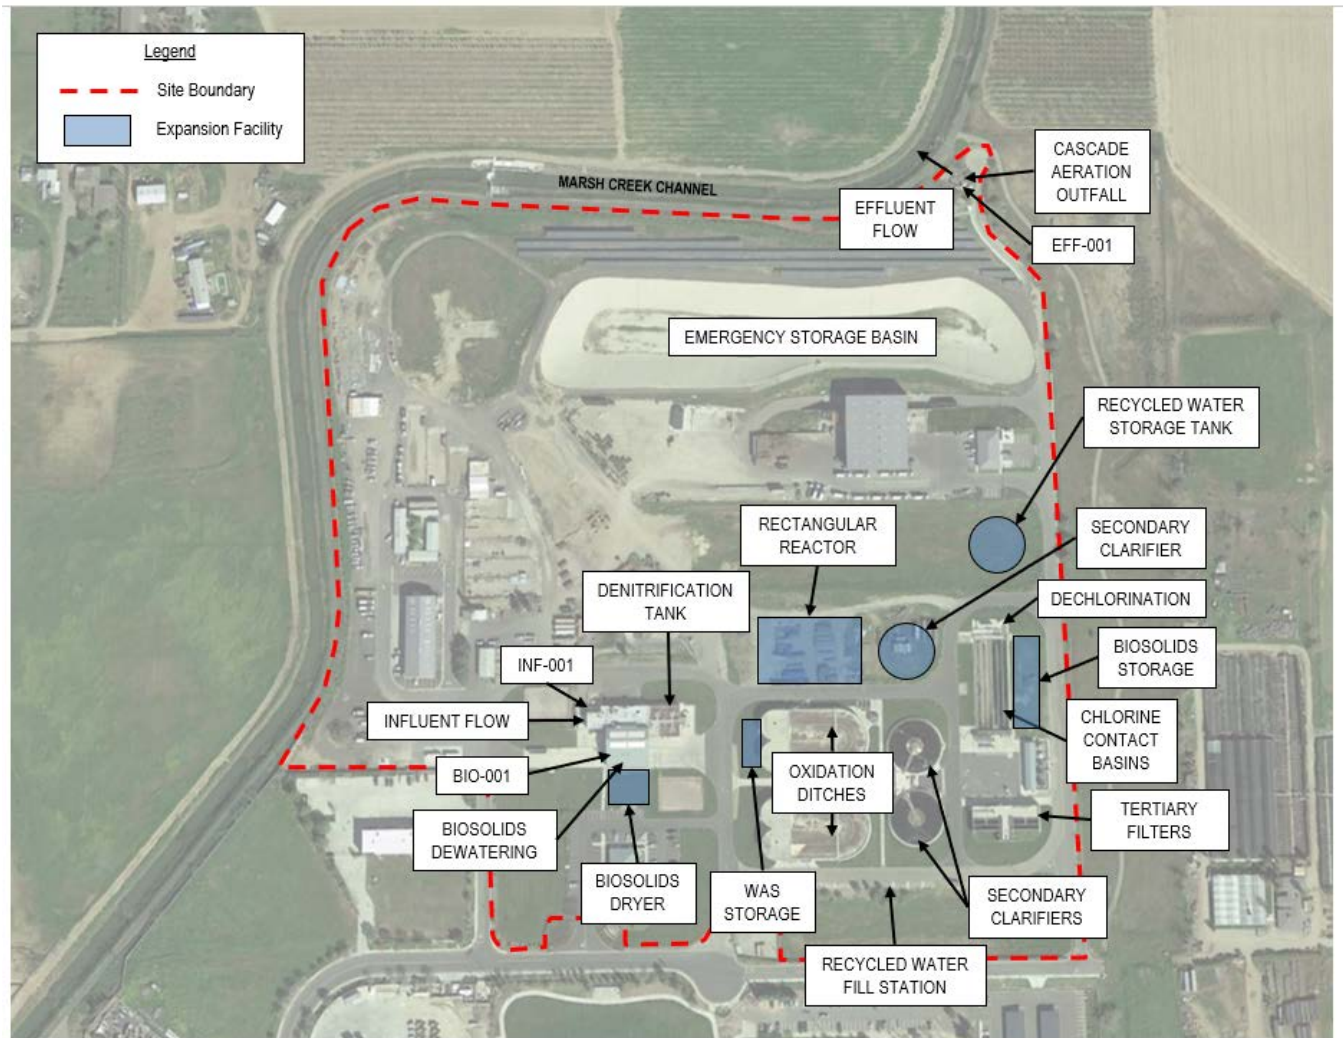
Future City of Brentwood Wastewater Treatment Plant Site Plan
